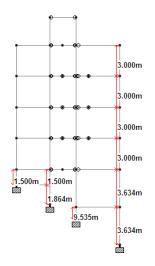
Elevation of residential building on 30 deg. Slope
